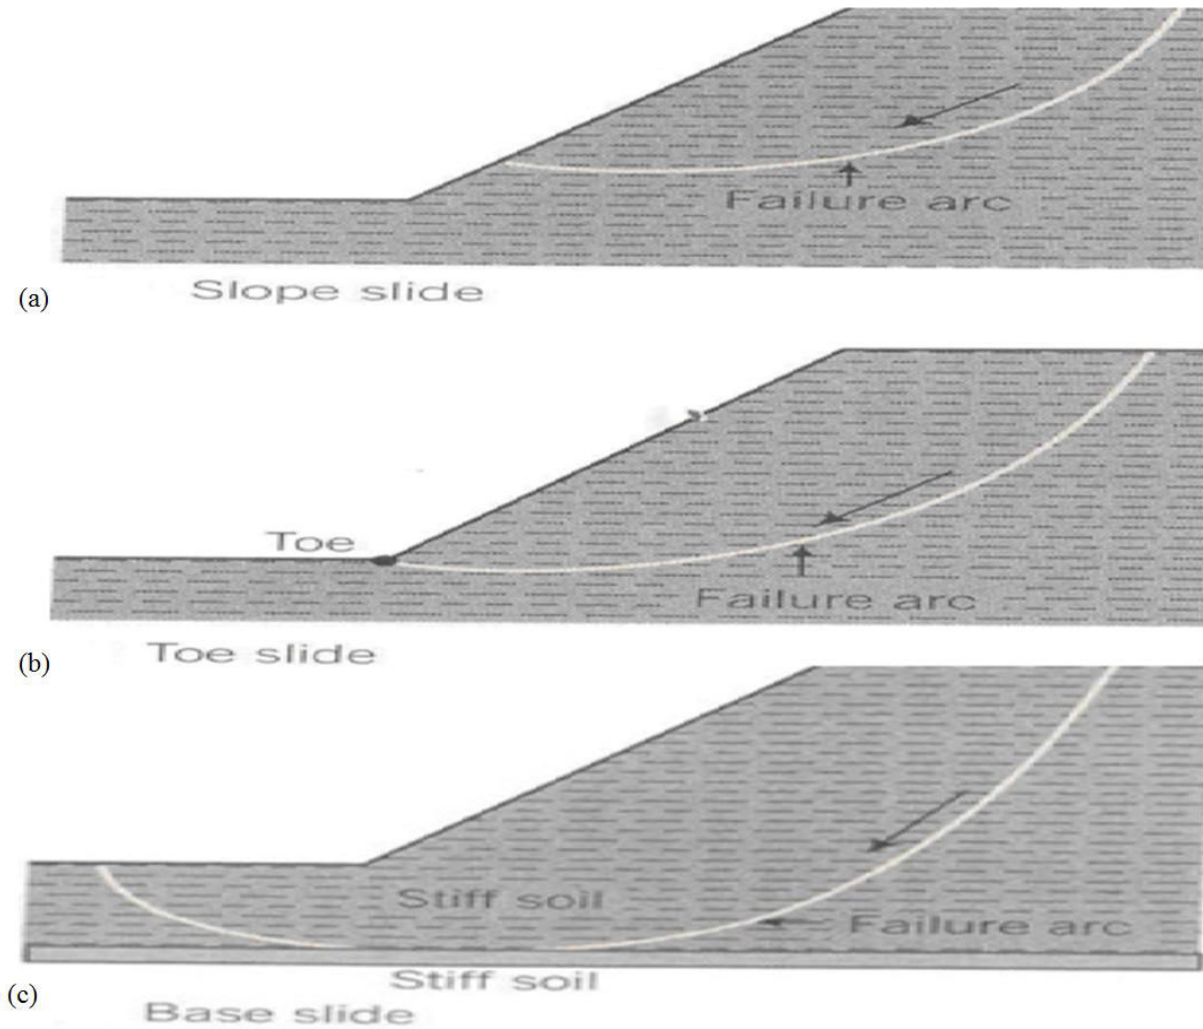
Types of slope sliding/failures. (a) face (slope) failure. (b) toe failure. (c) base failure (Dinesh 2008).
